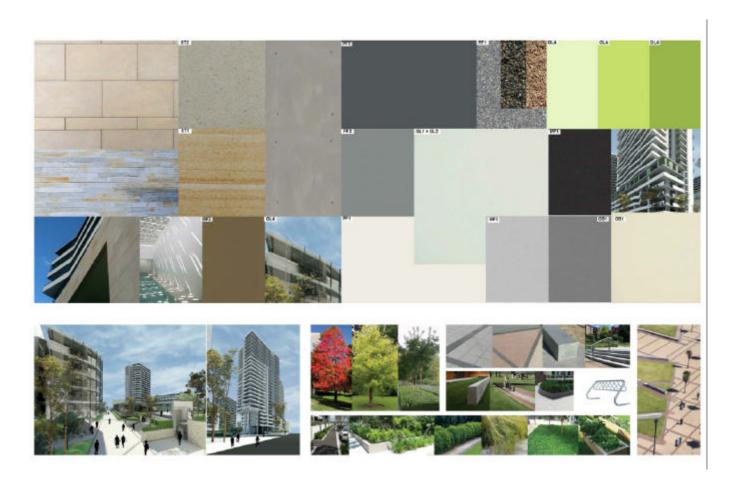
Proposed materials & finishes of buildings and landscaping It is noted that the public open space and public facilities will be subject to a separate Part 4 Development Application.
